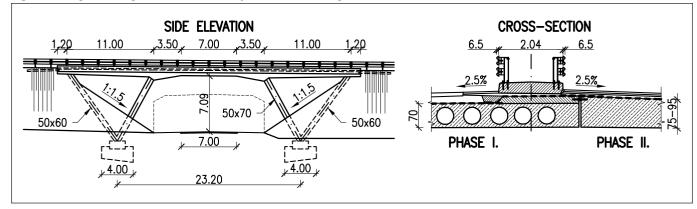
Drawing of the bridge over the road to railway station in Balatonvilágos
